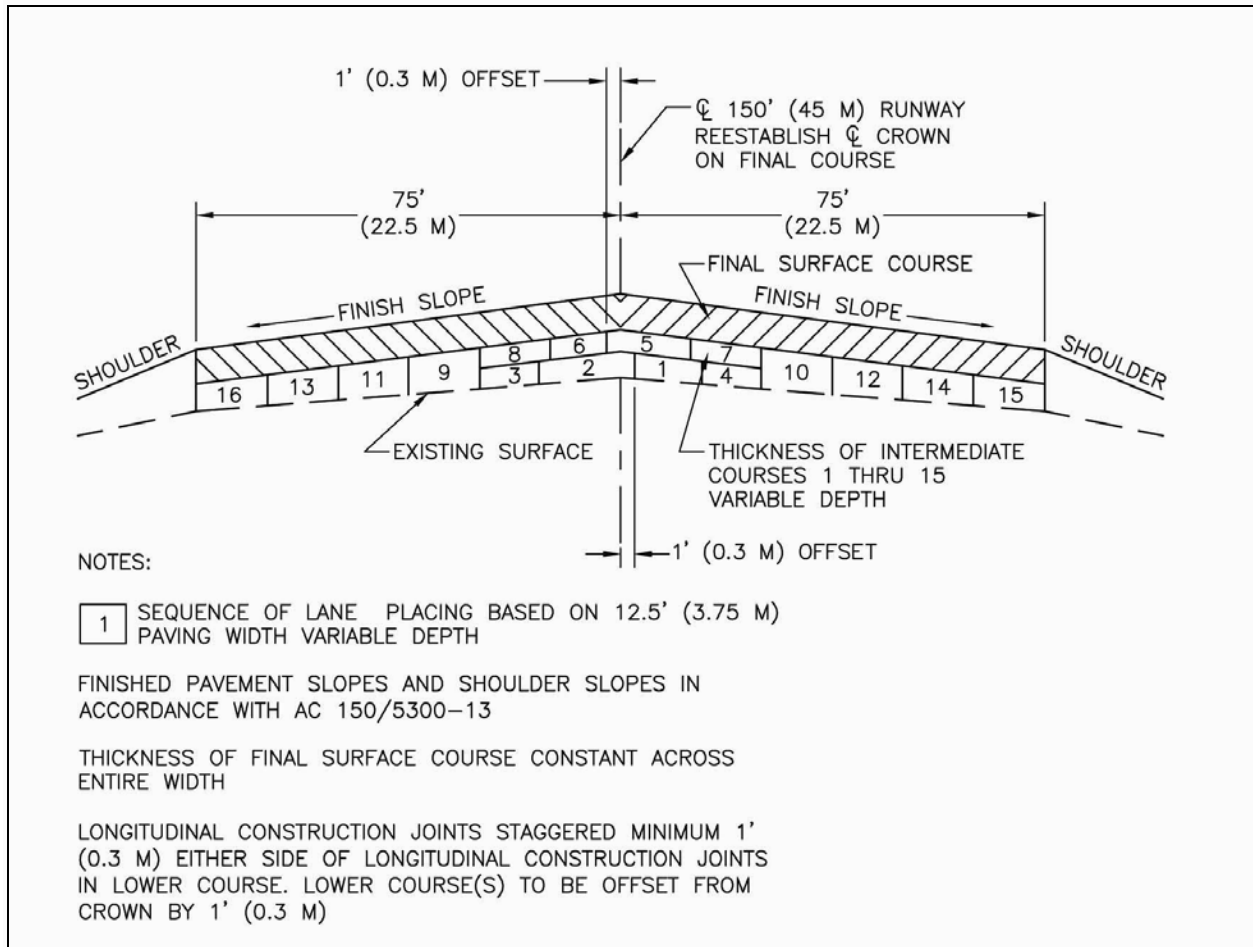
Typical Overlay Section – 150-foot (45M) Runway
